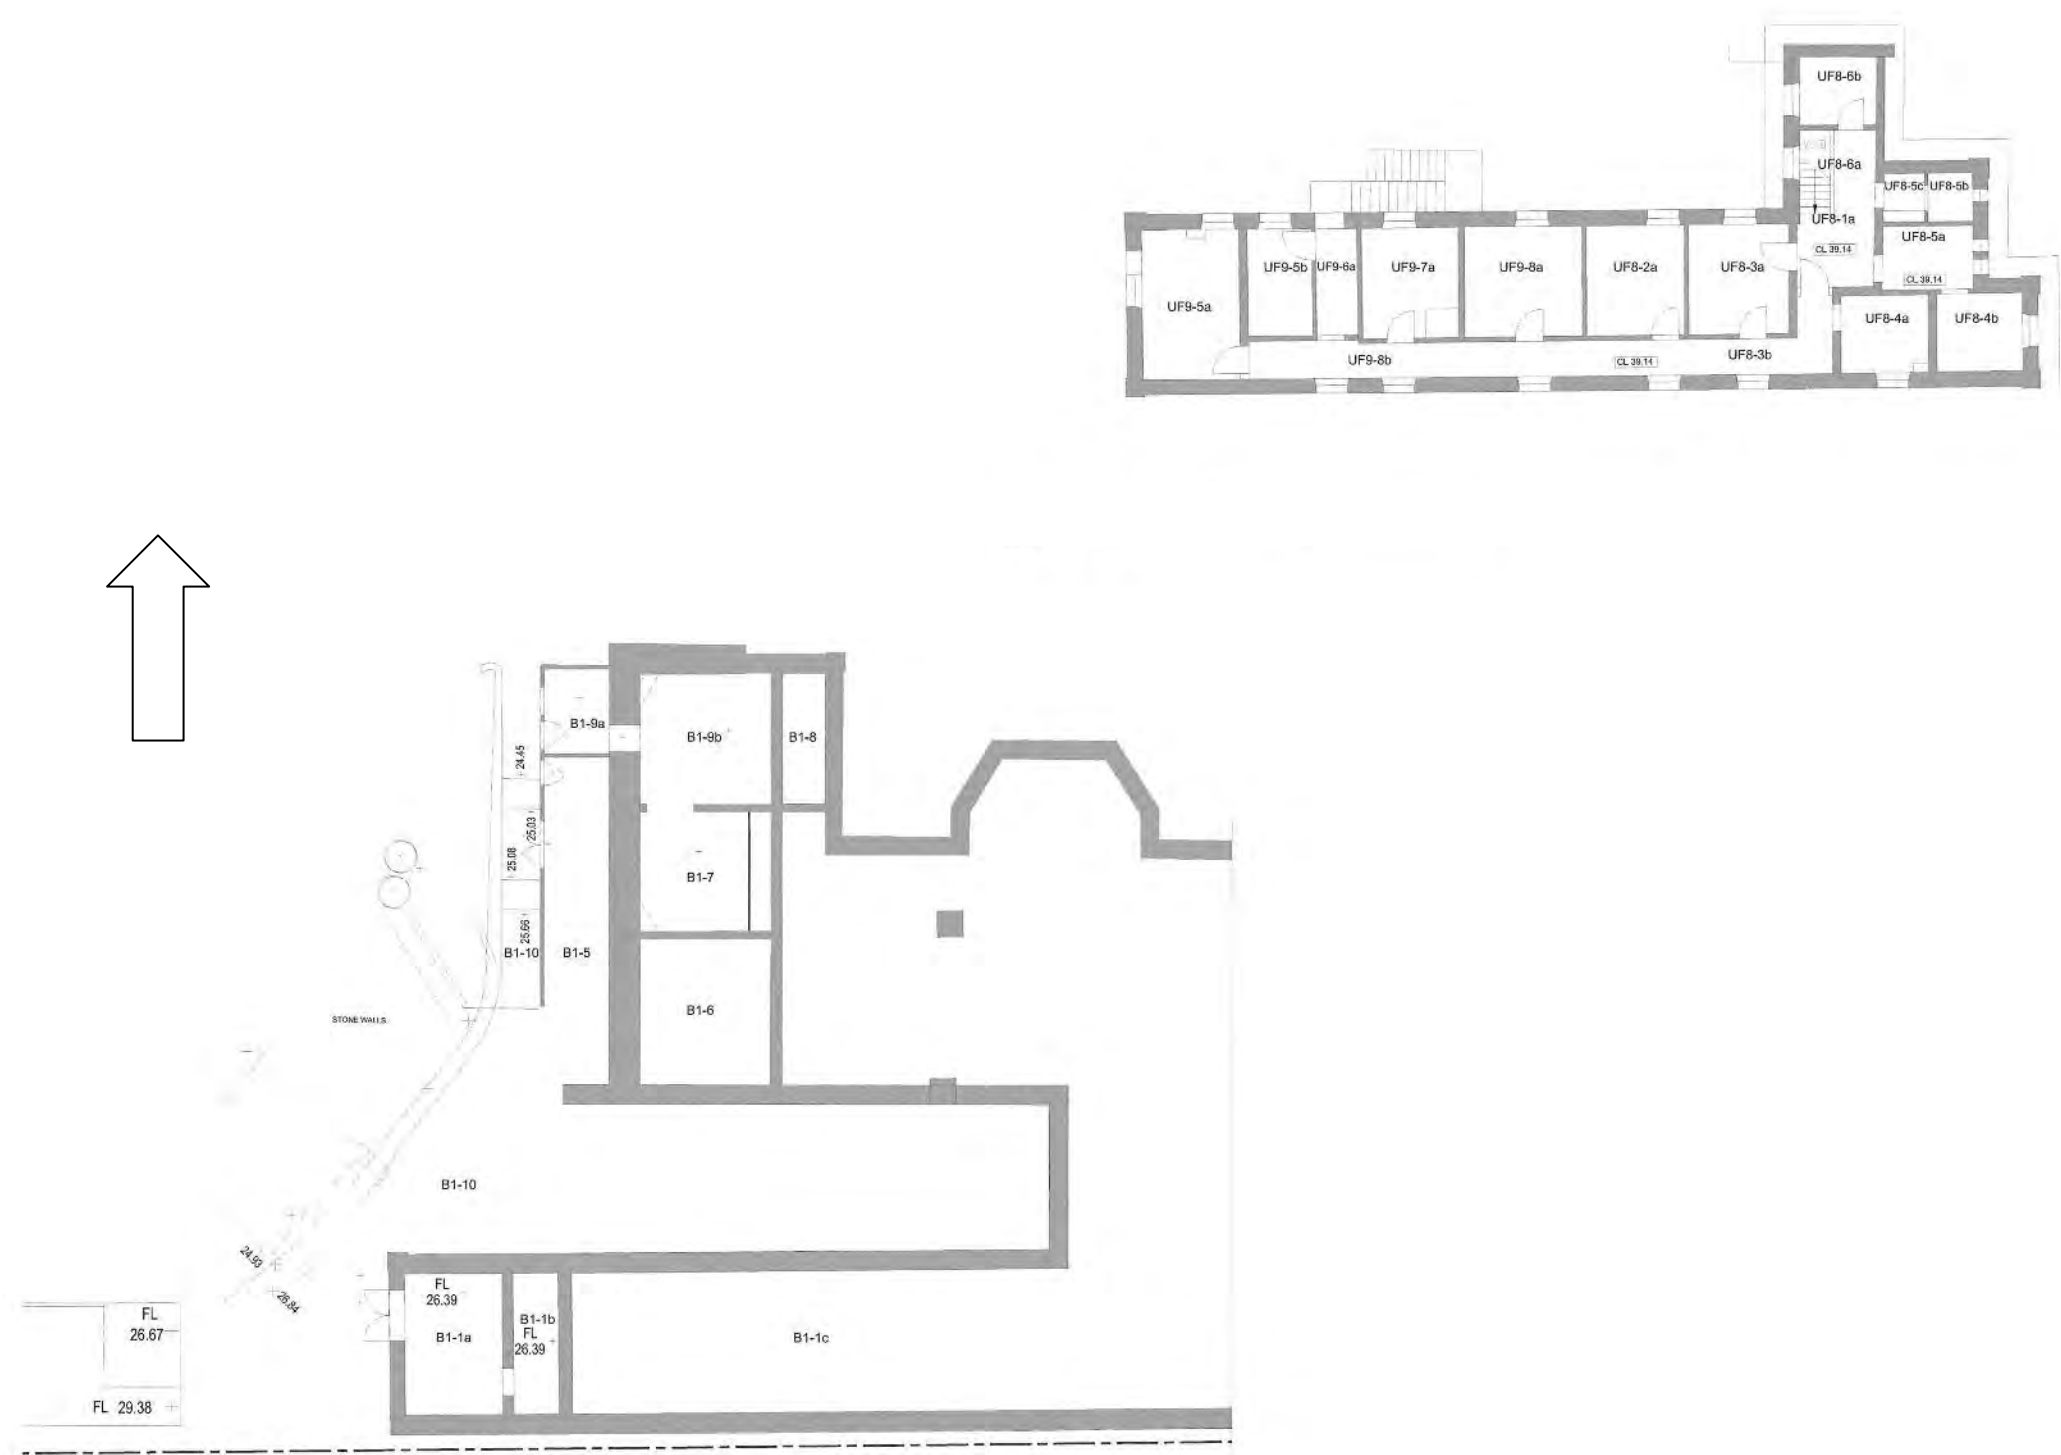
Plan showing the Basement and Upper Floor layouts and space numbers used throughout this report.
